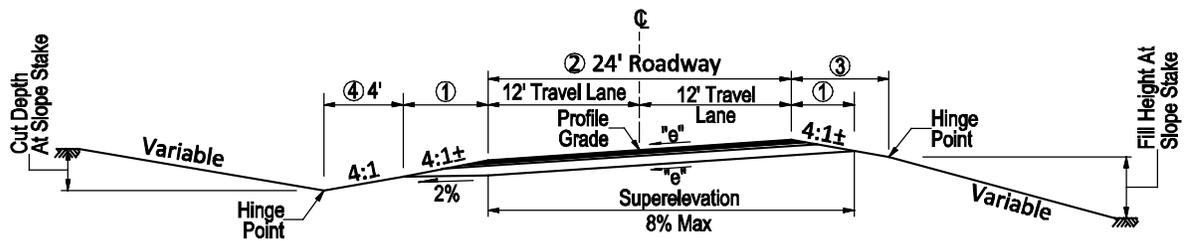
Typical Off-System Roadway (Tangent Section)
